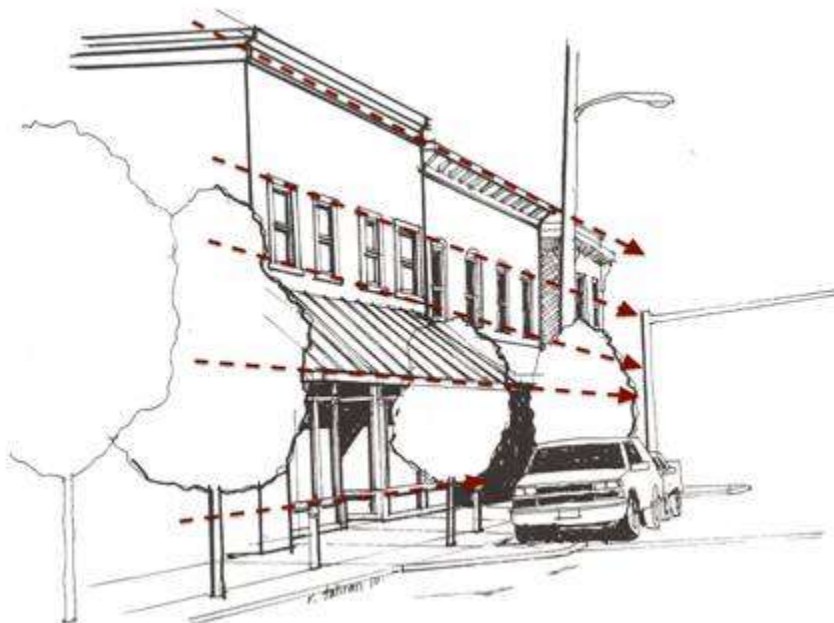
Articulation of Horizontal Lines, Ground Floor and Upper Floor Division
